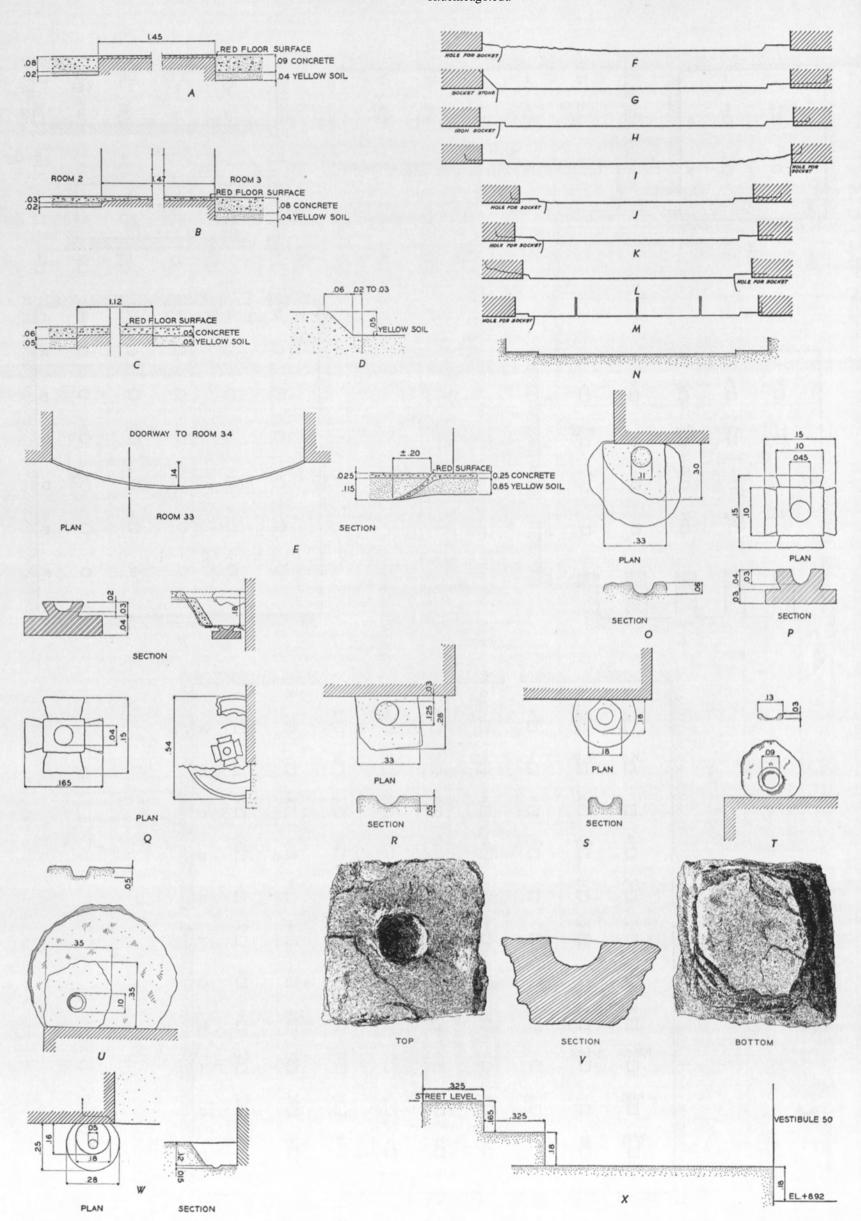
Treasury Floors. A. Center of Room 32. B. Doorway between Rooms 2 and 3. C. Southern Part of Room 72. D. Portico Edge in Passage 75. Scale, 1:8. E. Doorway between Rooms 33 and 34
